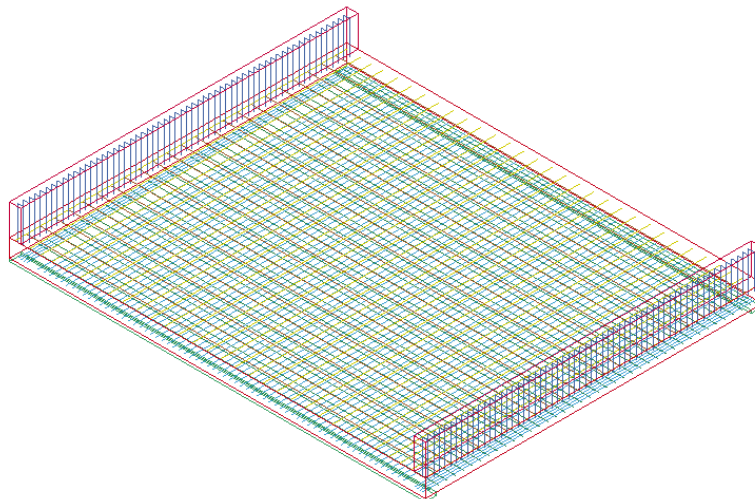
3-D View of Rebars in the Archetype 1 Bridge Model
